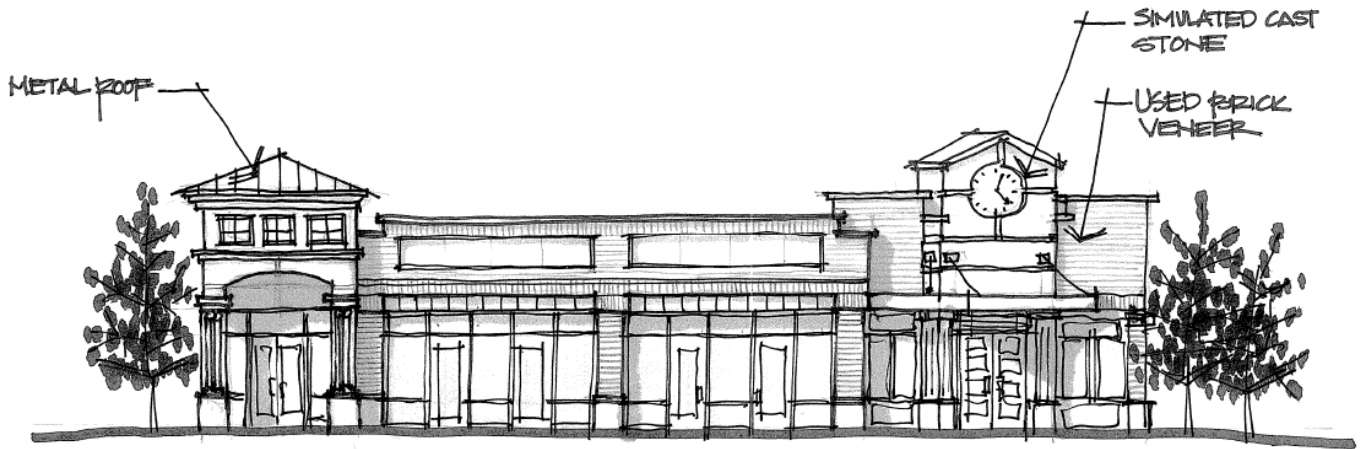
Proposed Blacksmith Shop, Addition (Building A), and "Sister Building" (Building B)
